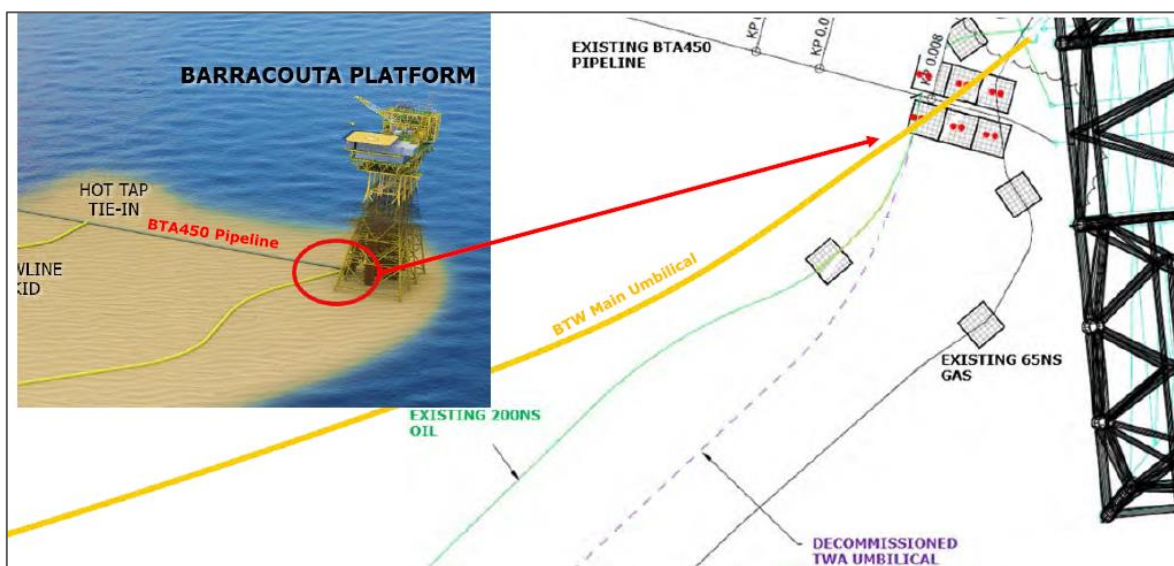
Detail of existing pipeline layout at Barracouta Platform
